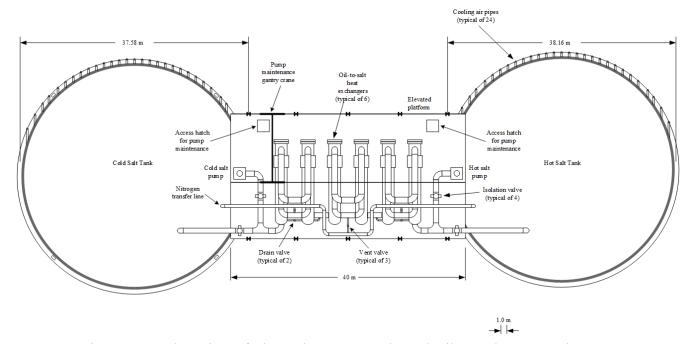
Plan View of Thermal Storage Tanks and Oil-to-Salt Heat Exchangers
